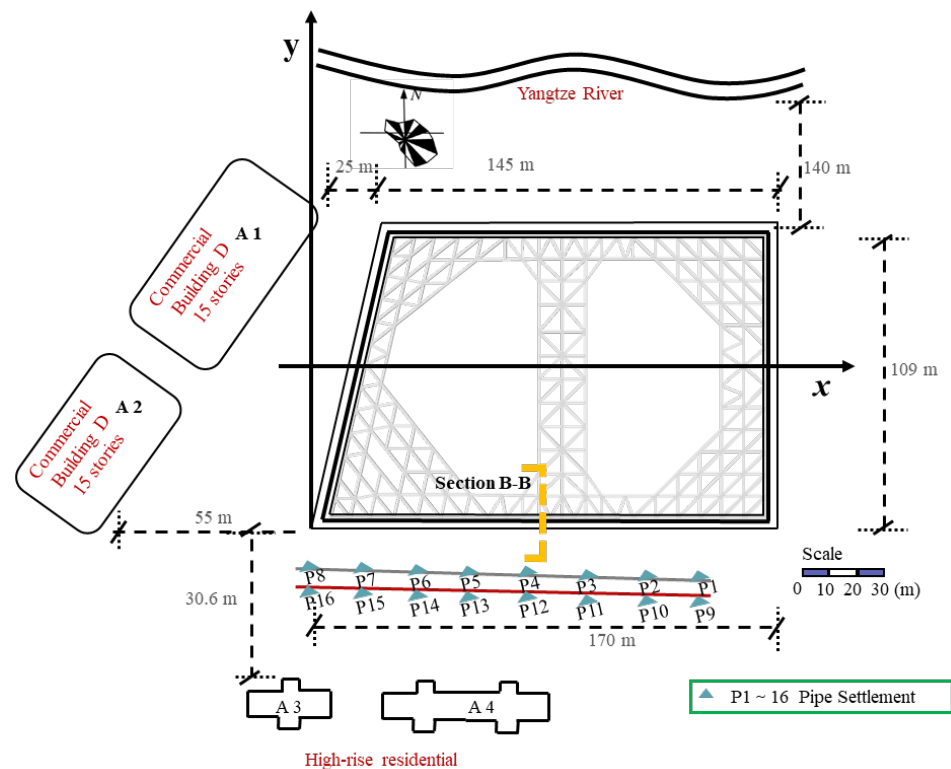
Schematic layout of pipeline settlement monitoring points (unit: m).
